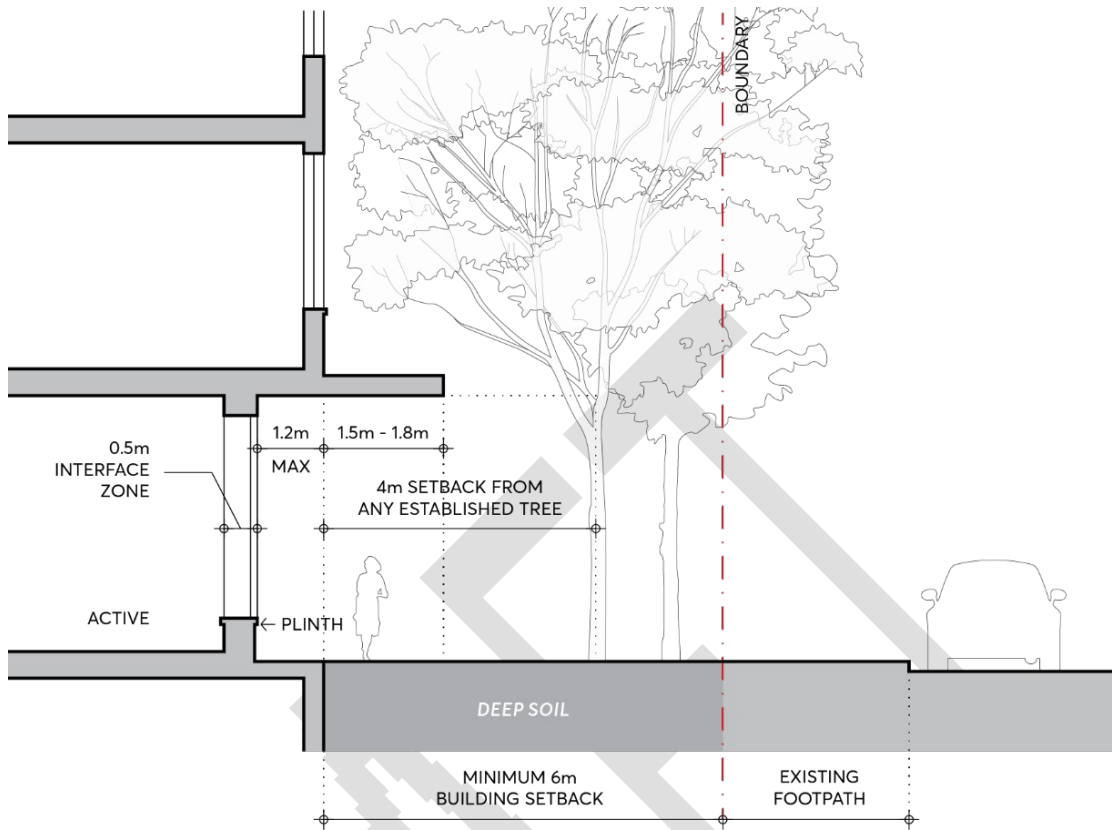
Great Western Highway Ground Floor Interface
